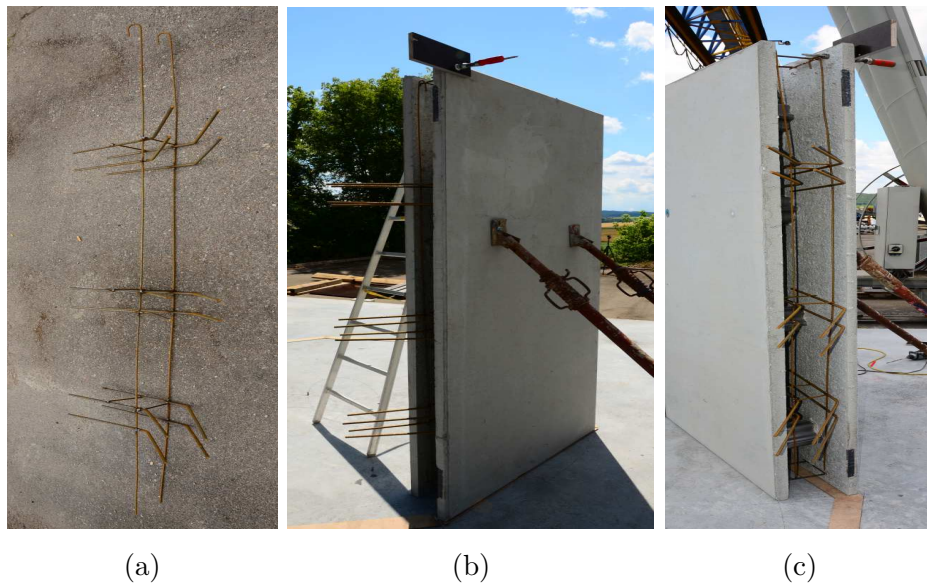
Horizontal reinforcement in the ring segment direction; (a) welded to vertical bars; (b) placed into one element; and (c) hooked to the U-reinforcement at the top of the element
